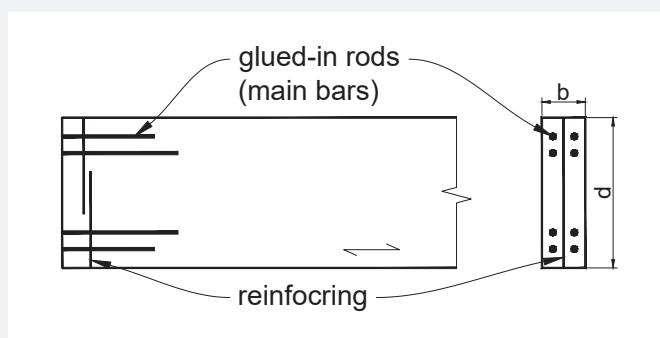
Transverse reinforcement due prevent splitting (modified from Buchanan 2007).
